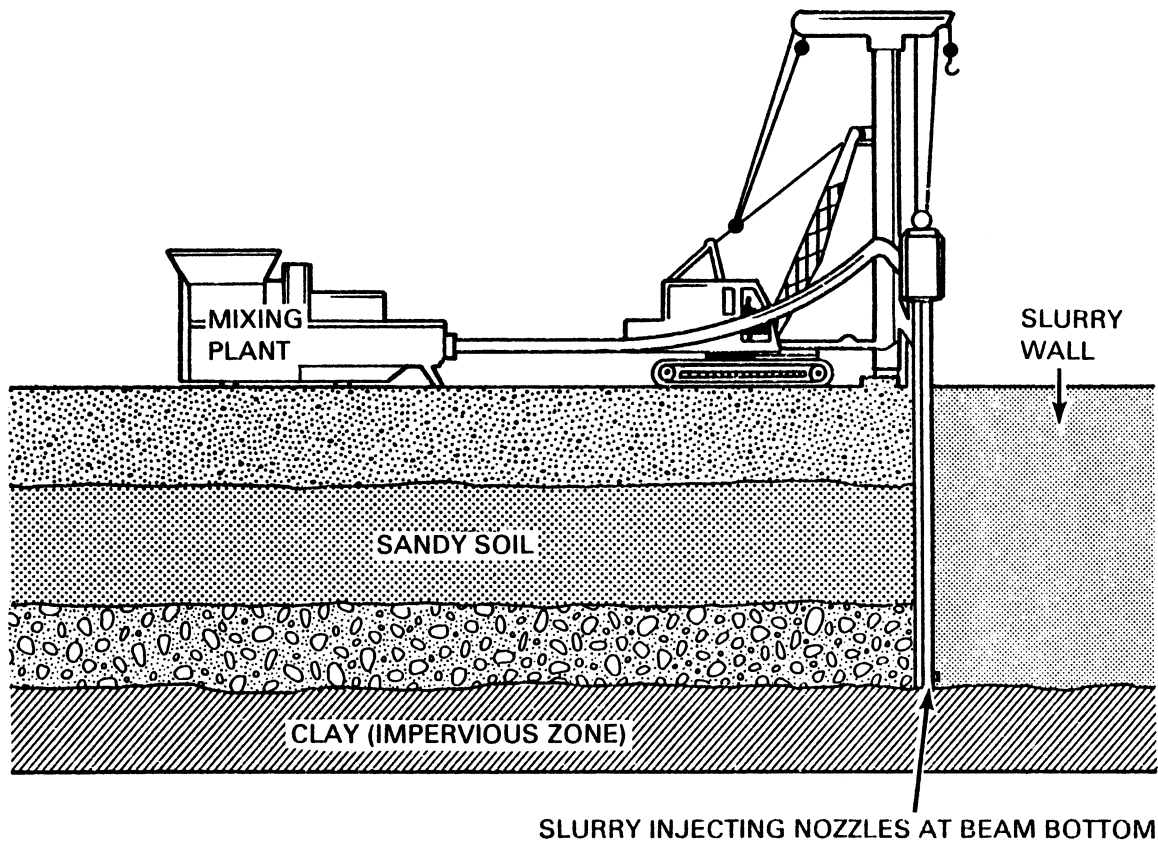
Vibrating-Beam Slurry Wall Construction
